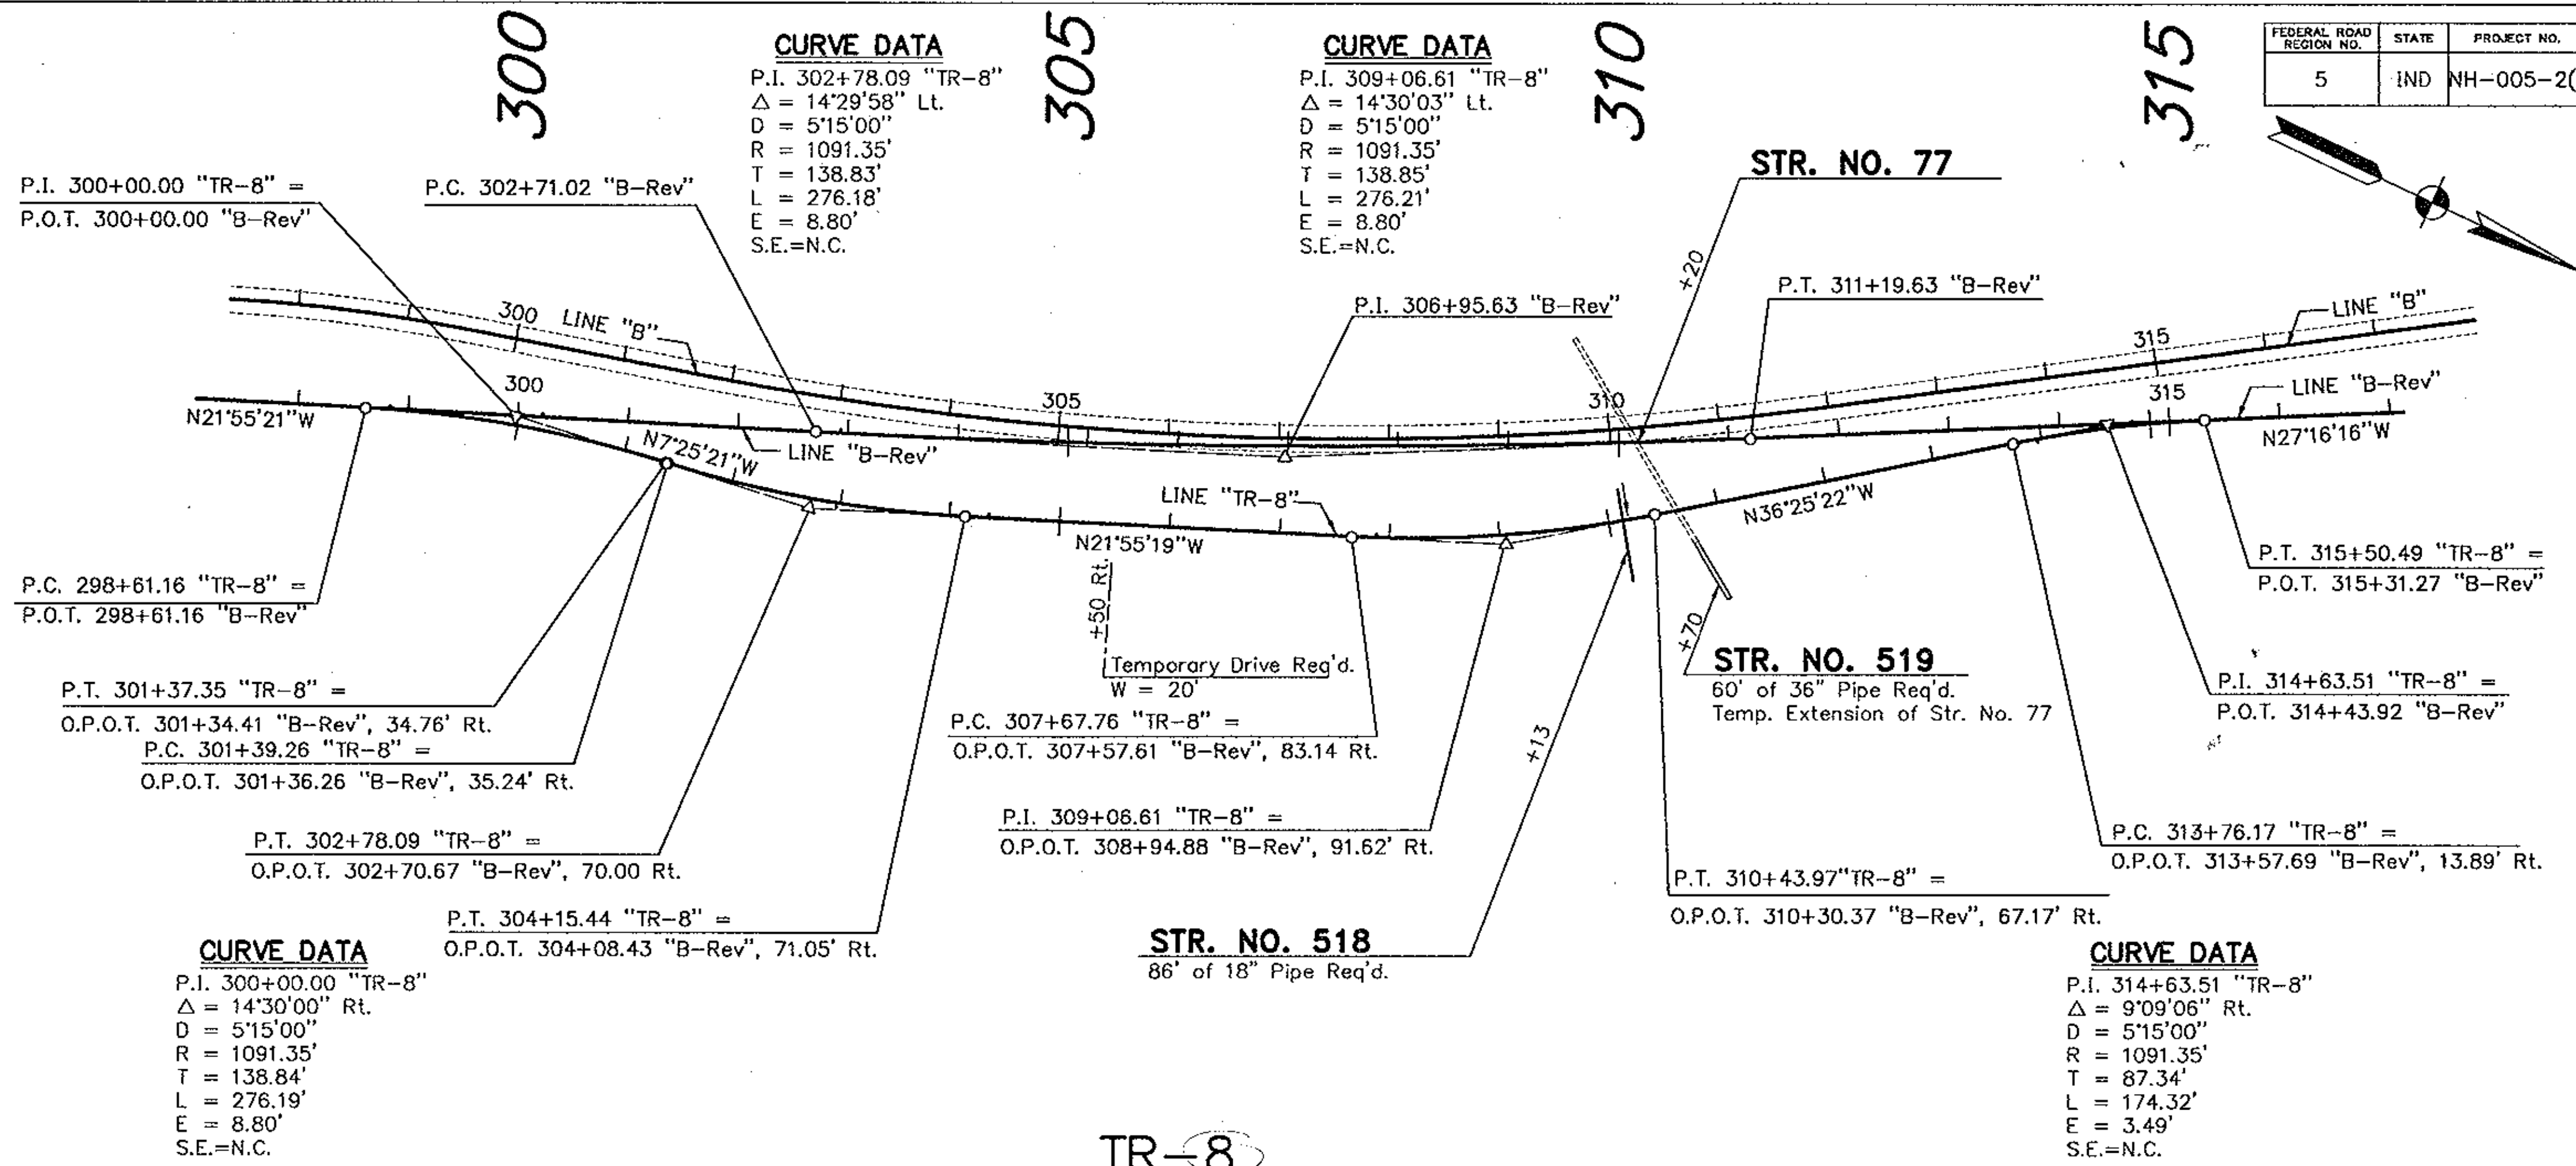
PLAN - PROFILE ©. R. R. STANDARD 1975
